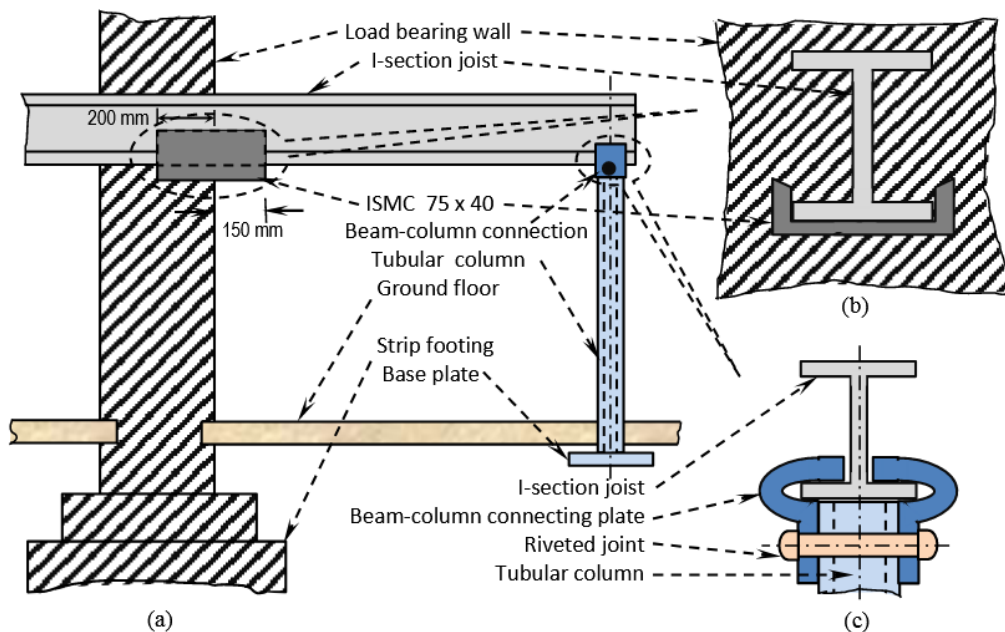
Rehabilitation and retrofitting of I-joist: (a) Basic principle, (b) Repair at joist-wall connection, and (c) Beam-column connection
